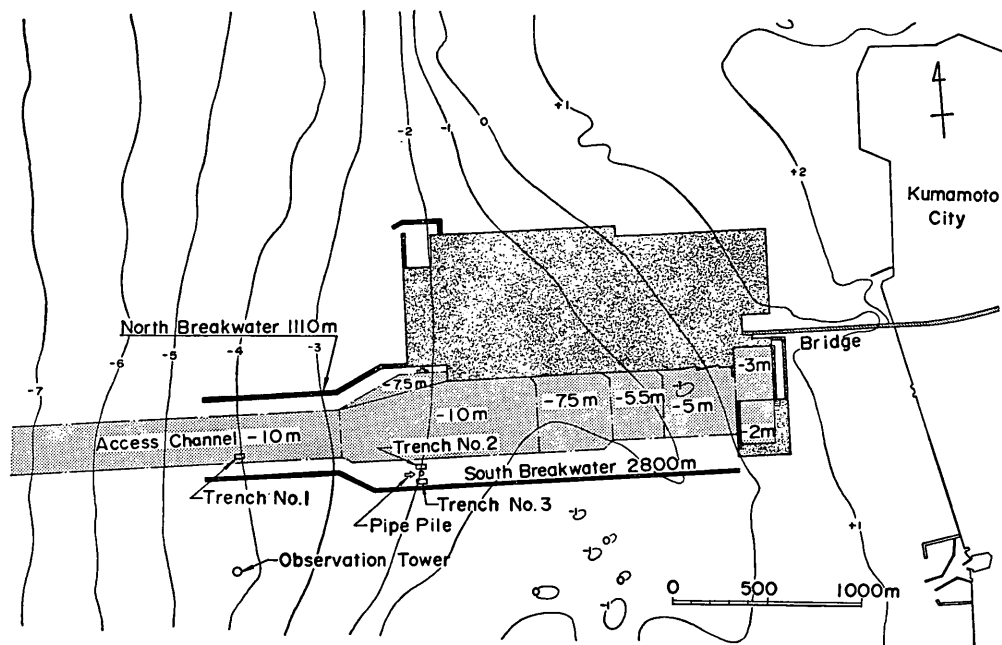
Plan of Kumamoto Port and Field Observation Site
